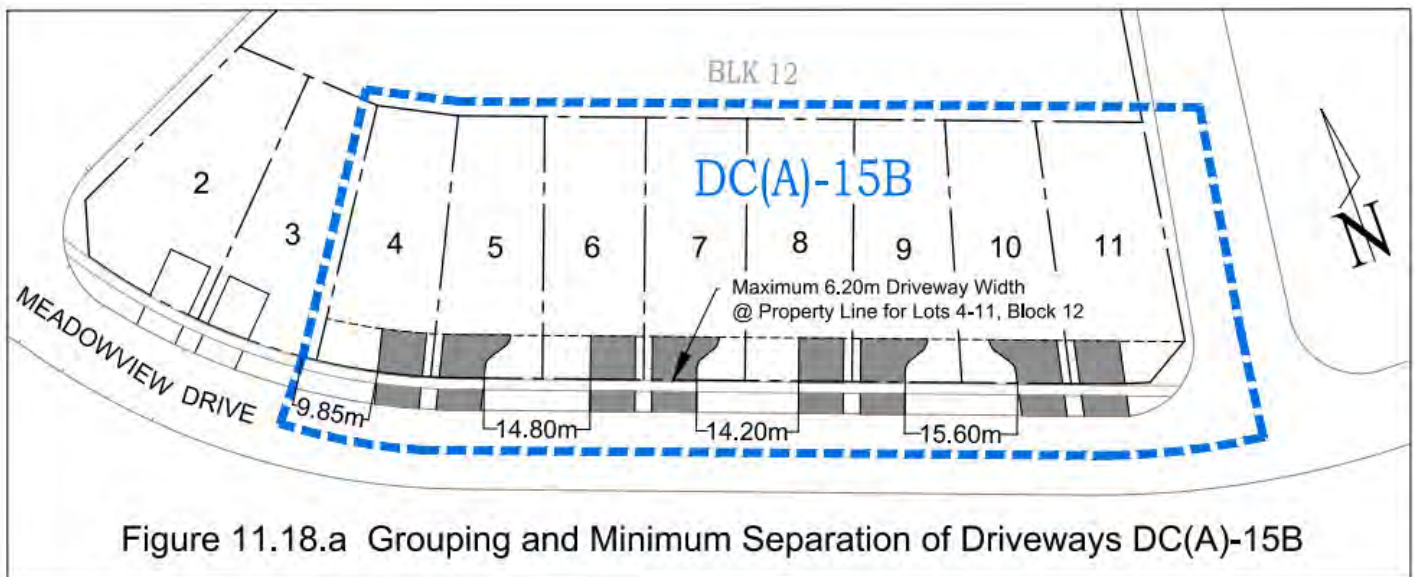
a Grouping and Minimum Separation of Driveways DC(A)-15B
